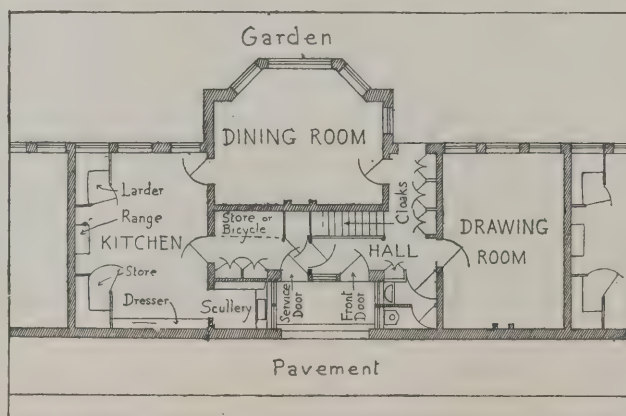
GROUND FLOOR PLAN, SHOWING DOUBLE ACCESS FROM STREET.
